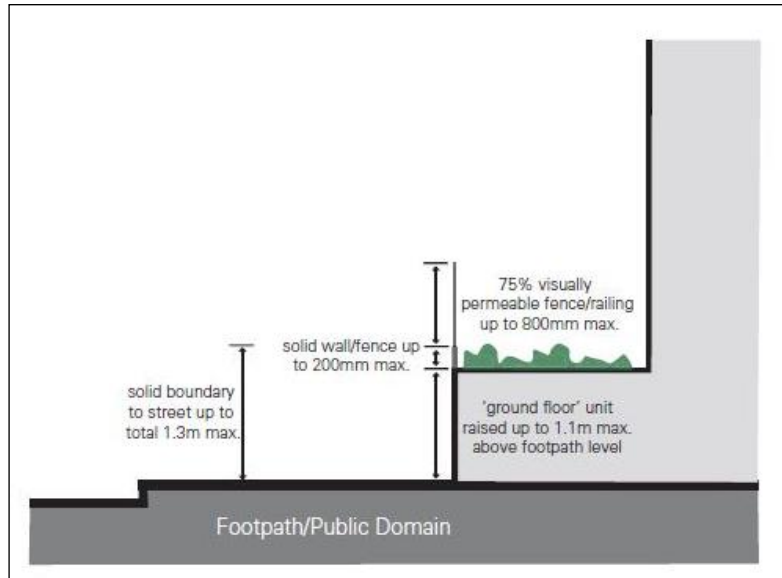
Front fence controls where building is raised over 700mm and up to 1.1m above street level
